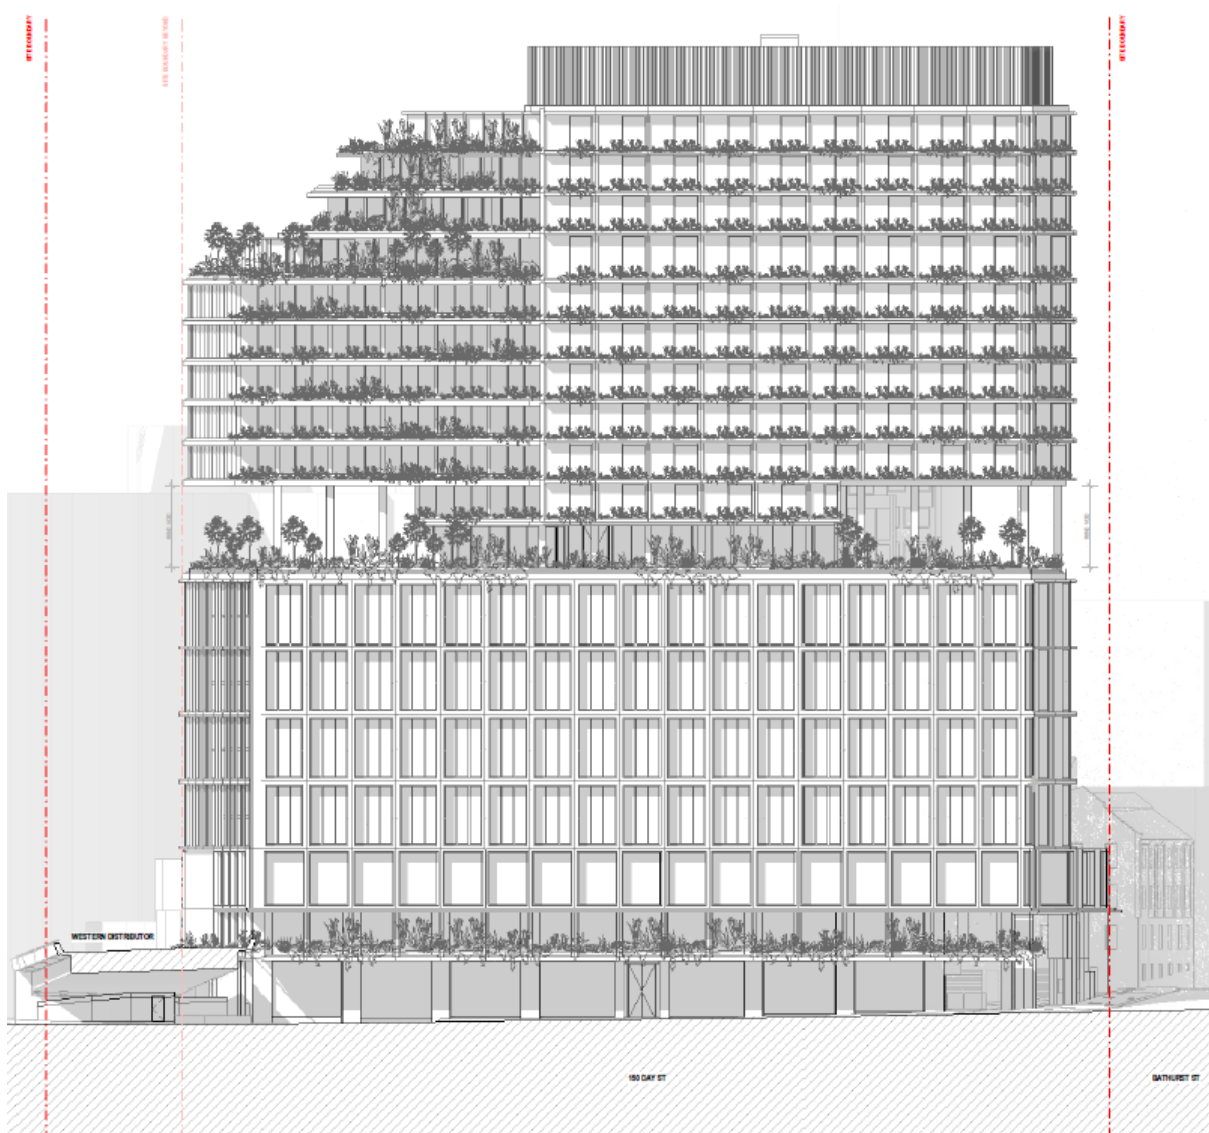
Technical drawing of indicative design - western (Day Street) elevation
